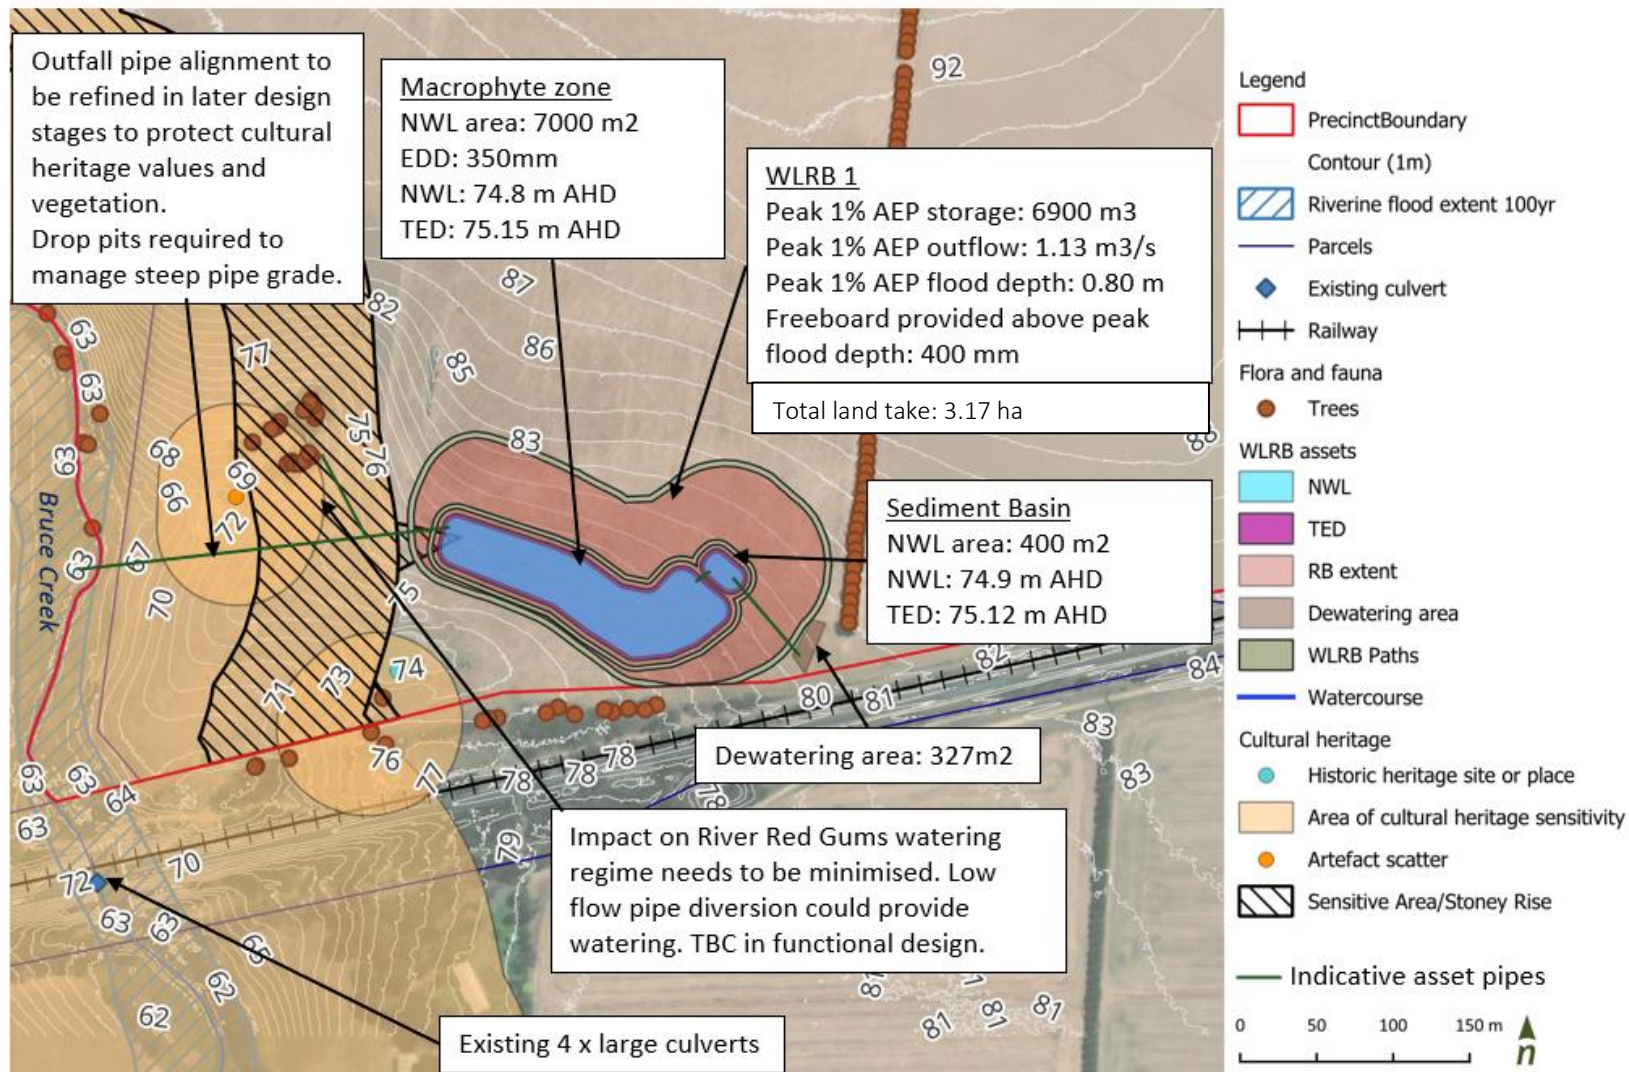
Concept plan overview for Bannockburn SE PSP stormwater drainage design
